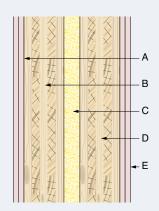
Typical acoustic-rated lightweight timber framed wall systems for Class 2 mid-rise buildings.
